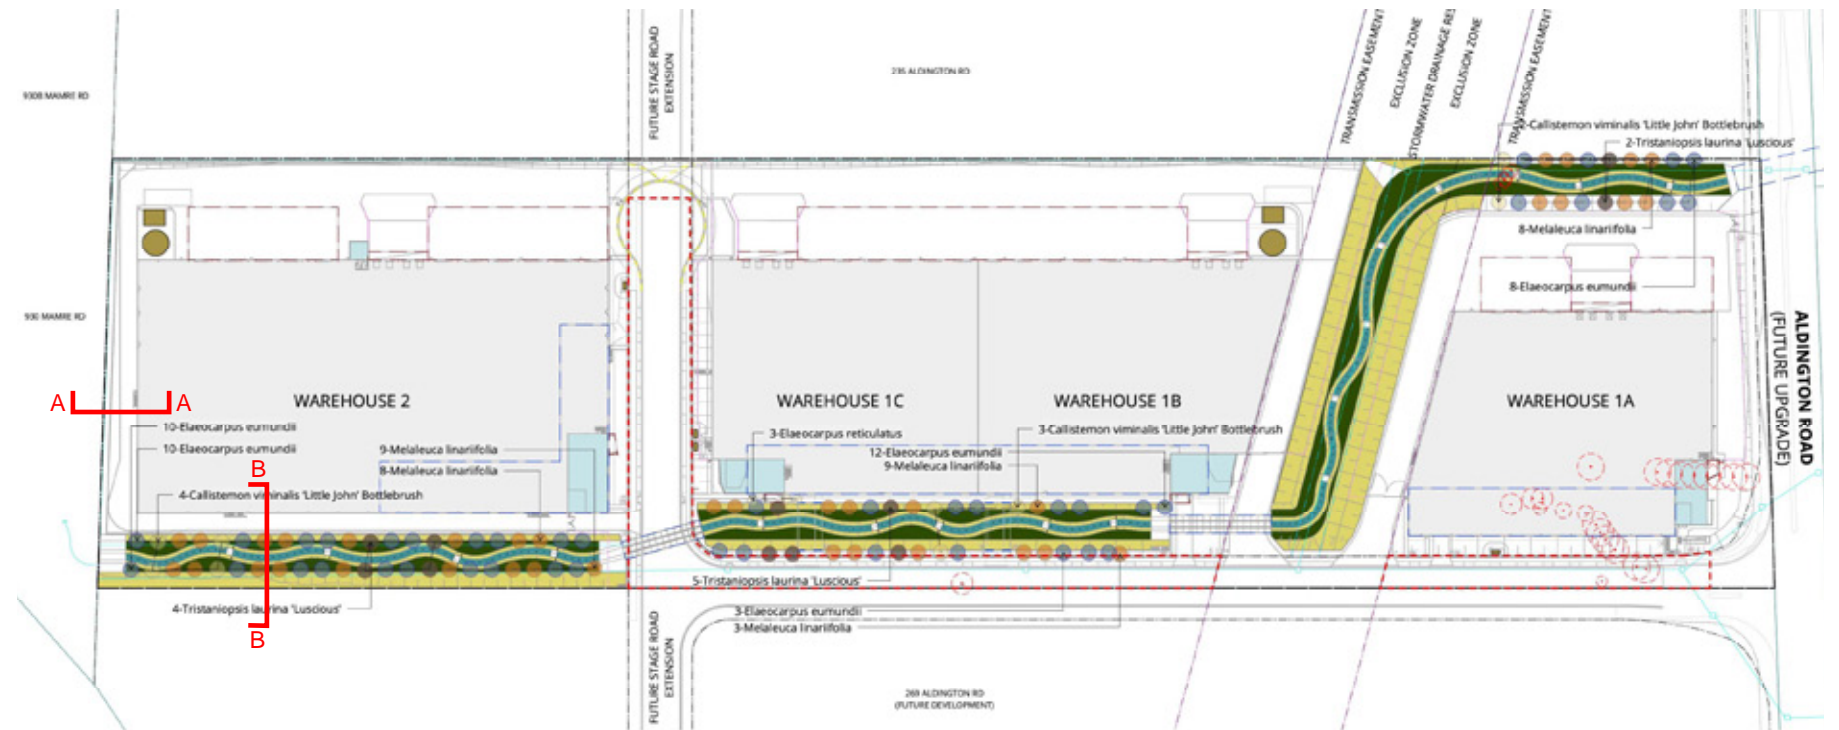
Landscape Plan (Trunk Drainage Channel) [Source: Scape Design]
